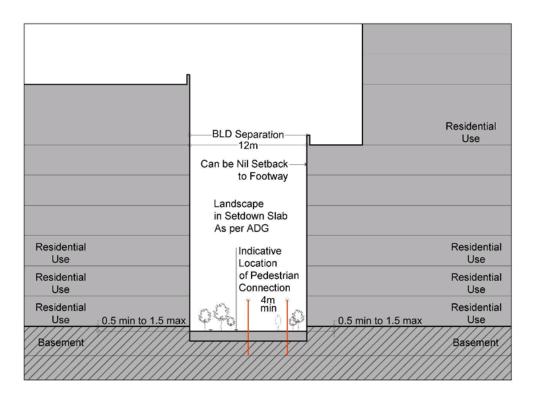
Street Wall Height at Pedestrian Connection, NTS
